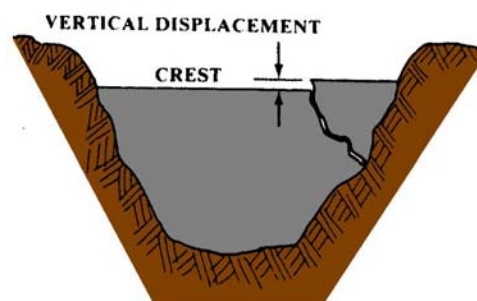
Foundation settlement or piping may lead to structural cracking with vertical displacement.
